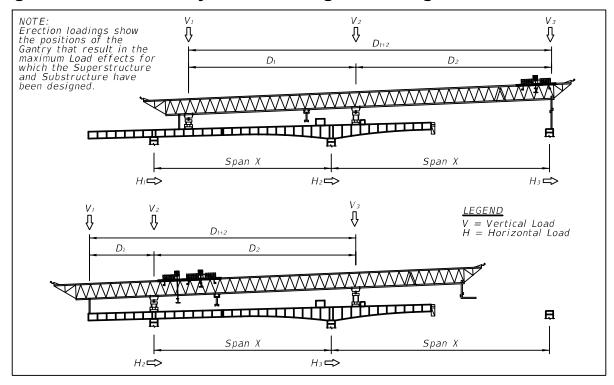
Gantry with Leg on Pier Segment
